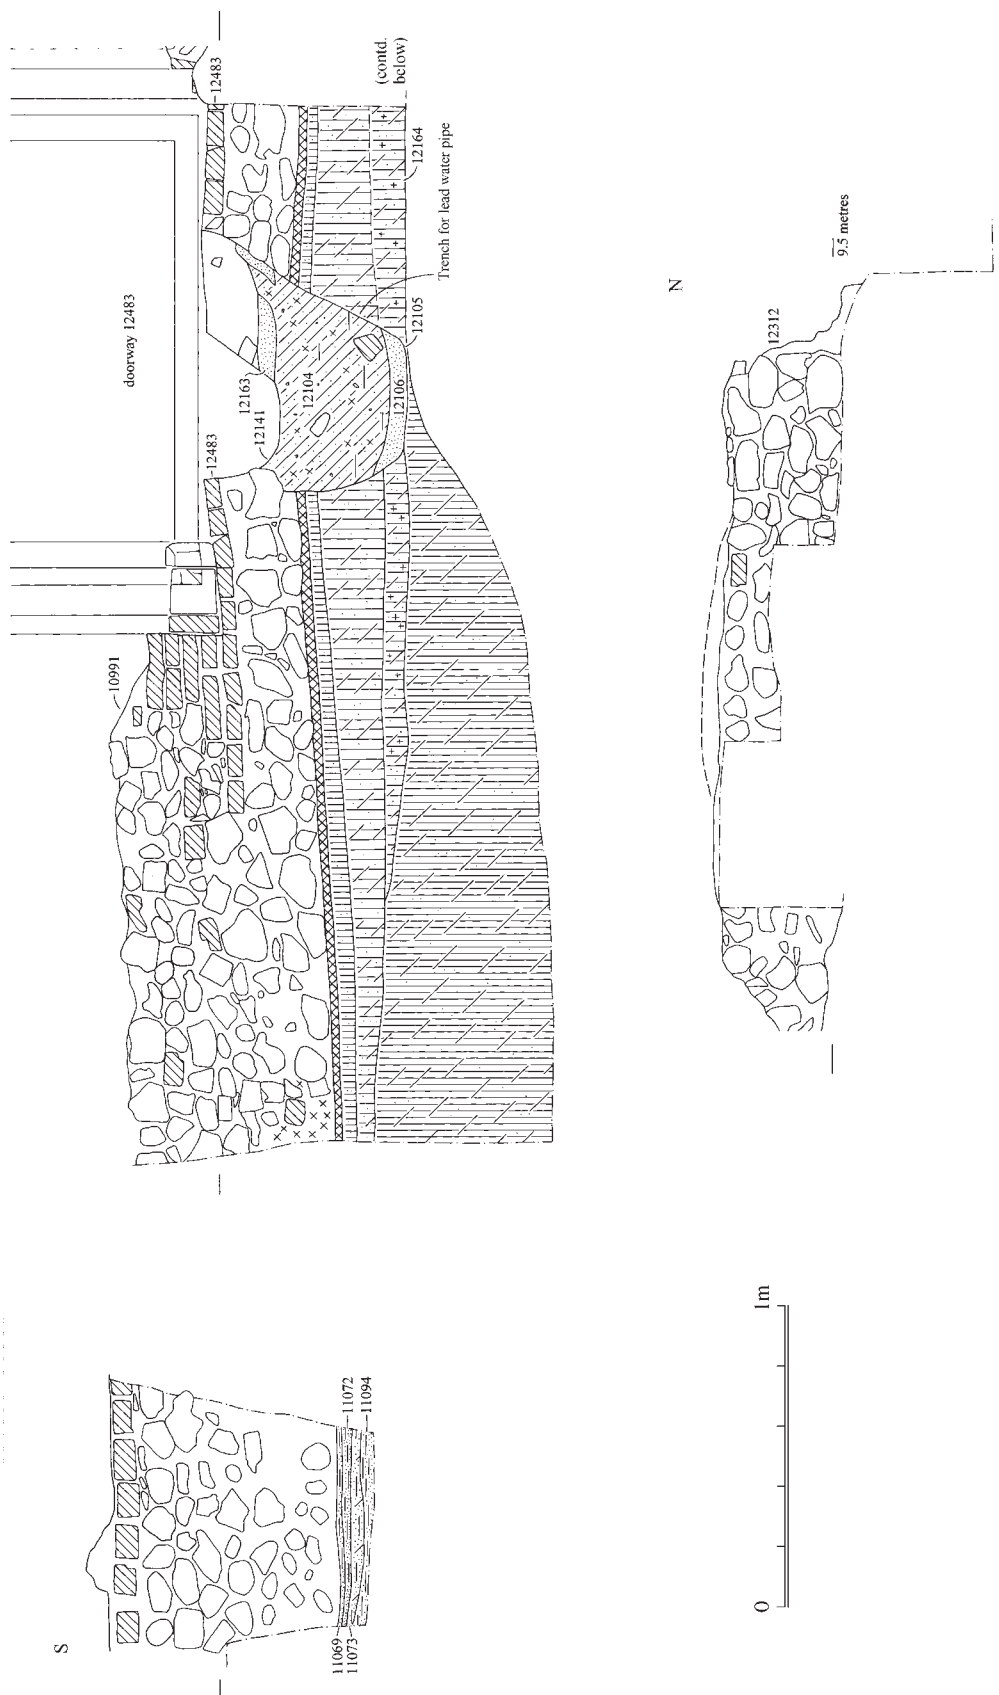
Elevation of eastern face of Friary building fronting King Street, showing doorway 12483, Area A
